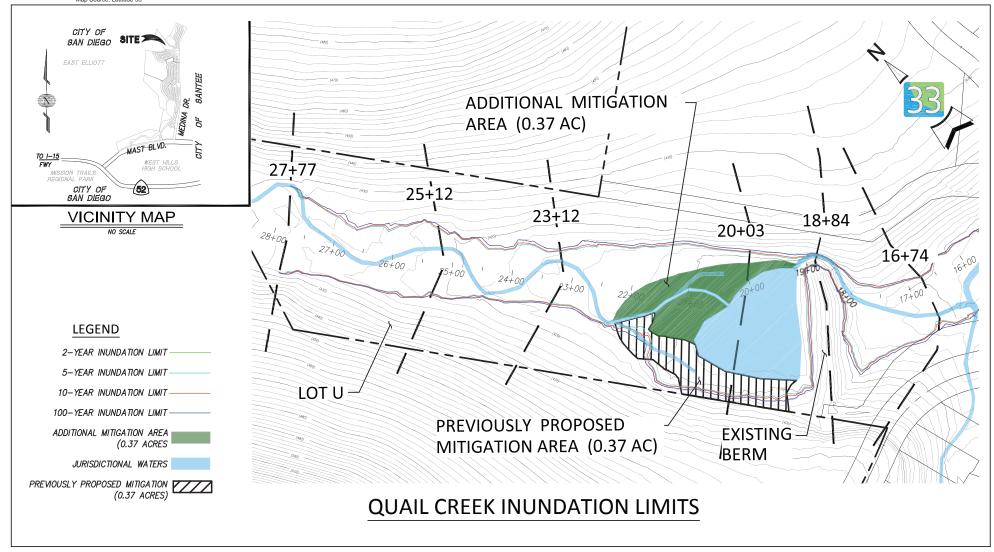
Surface Hydrology at Proposed Mitigation Site
